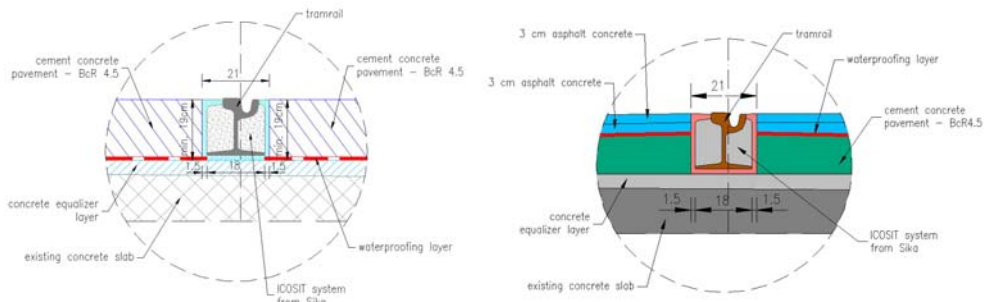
ICOSIT System on the Decebal Bridge and on the M. Vitezu Bridge
